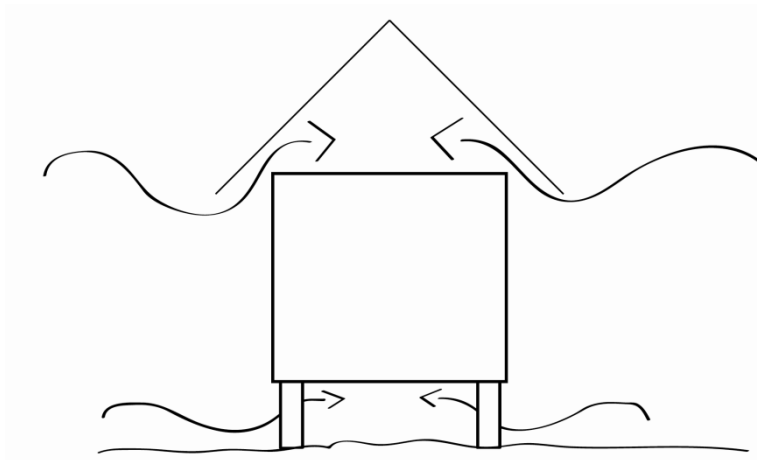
Building with bamboo sandwich panel as walls, illustrating necessary ventilation
